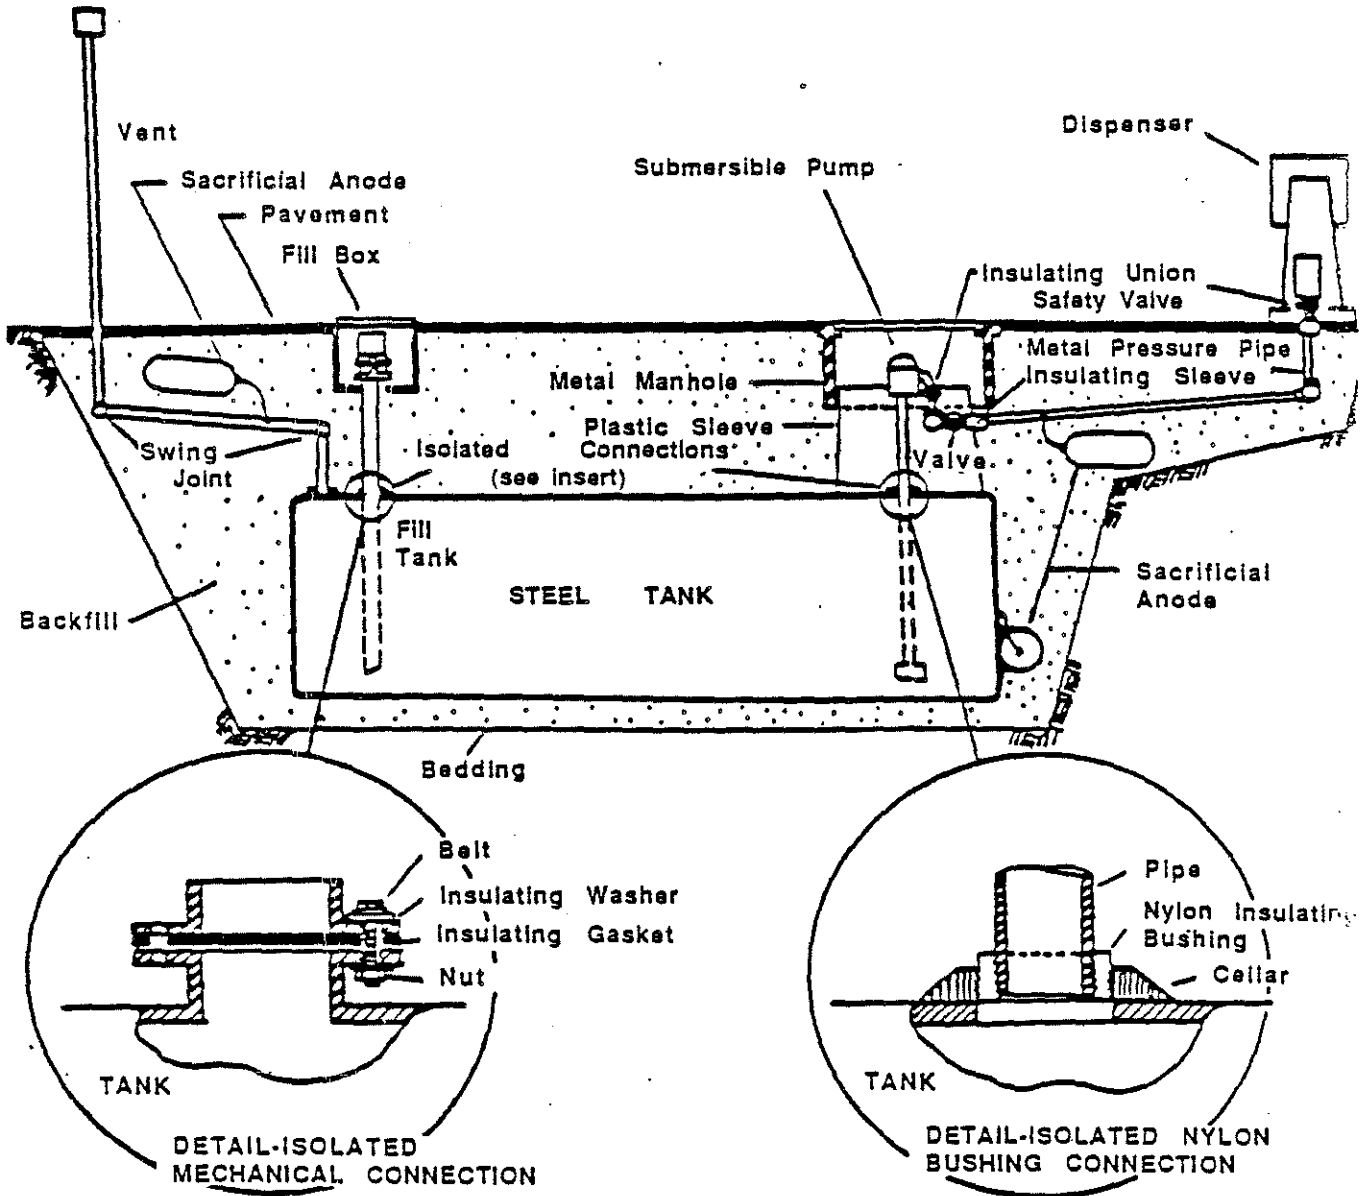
UNDERGROUND TANK AND PIPING SYSTEM
